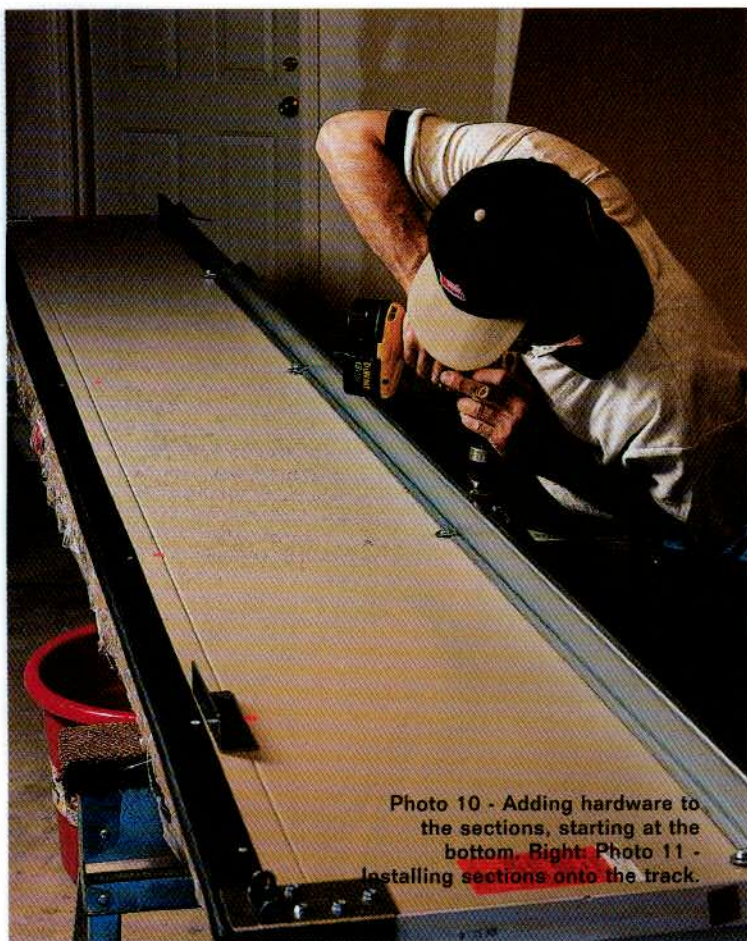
Adding hardware to the sections, starting at the bottom. Right: Photo 11 - Installing sections onto the track.
